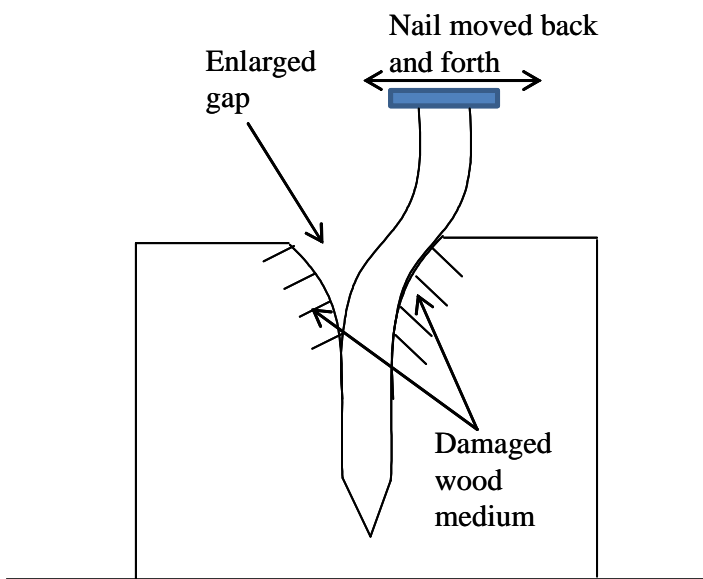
Wood damages around a nail's shank created a gap which deteriorated a stiffness of the wood and nail connection.
